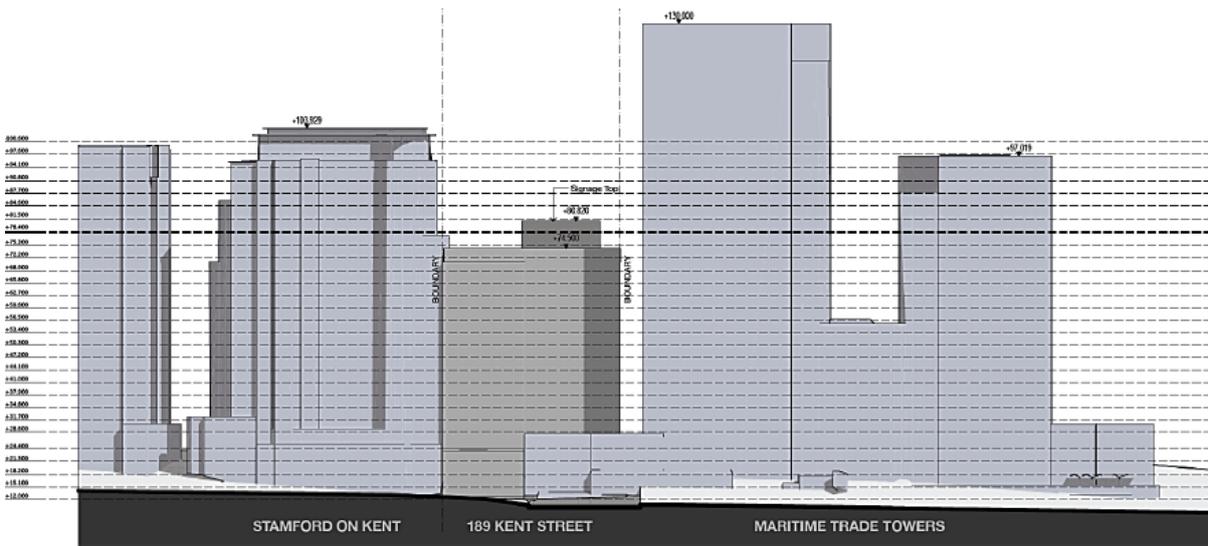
Extract of existing streetscape elevation to the eastern side of Jenkins St
